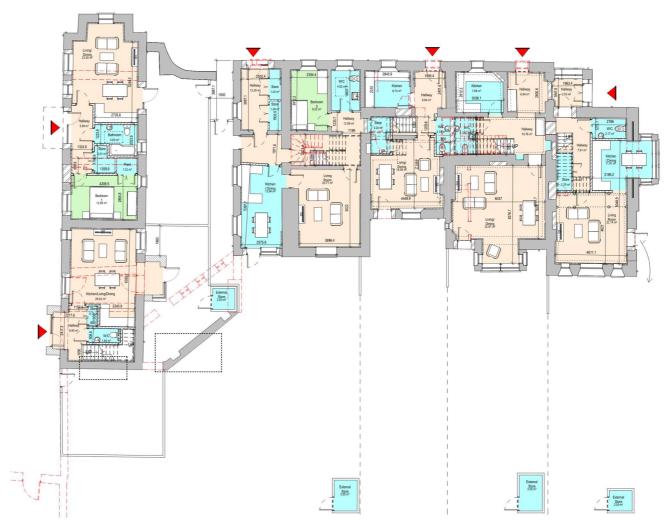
Ground floor plan proposals for the conversion of Rathellen House to social housing units.
